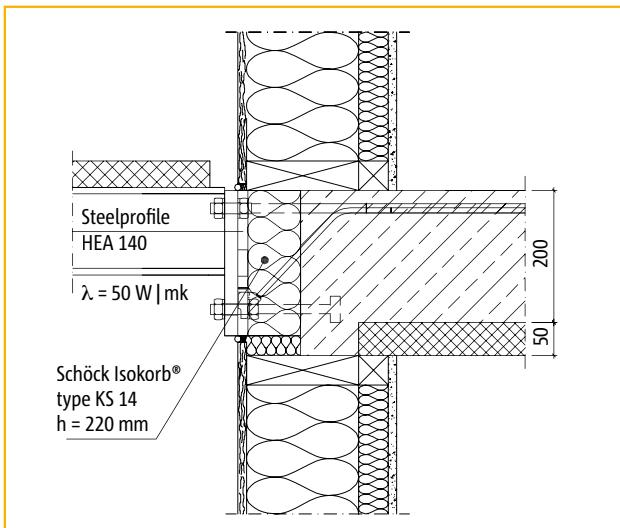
Connection of steel member HEA 140 with Schöck Isokorb® type KS14 and a composite thermal insulation system
